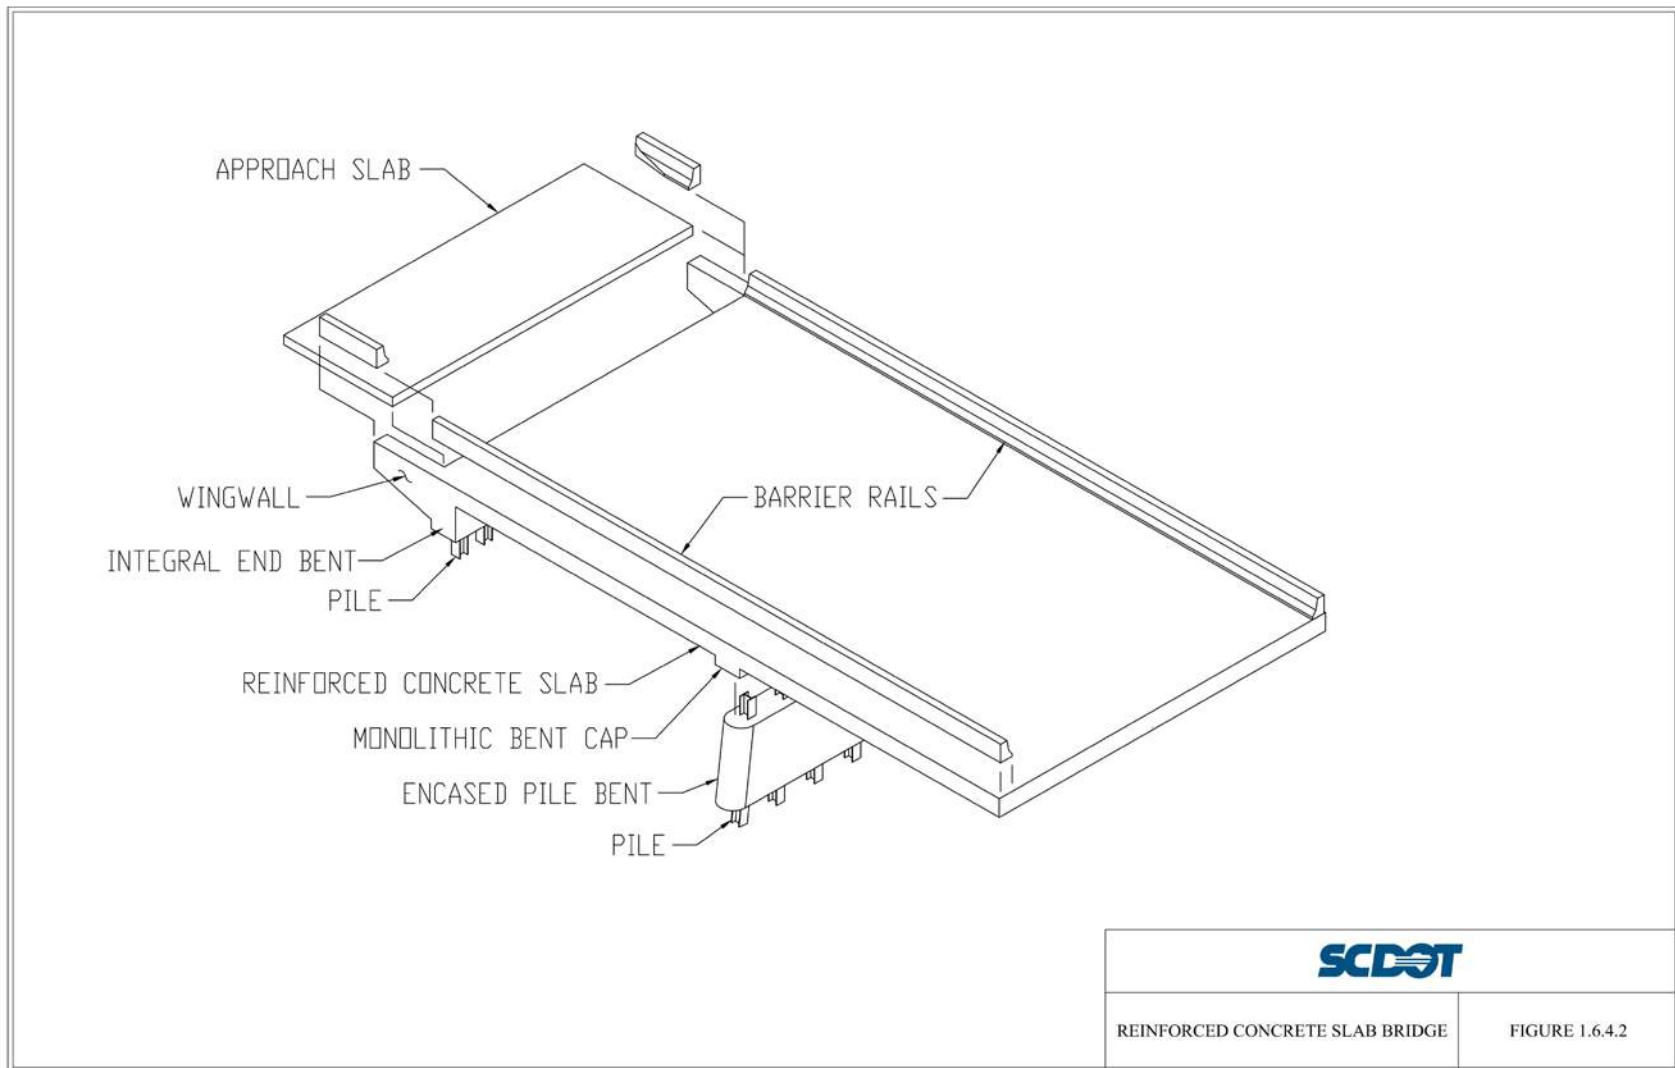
Reinforced Concrete Slab Bridge Components
